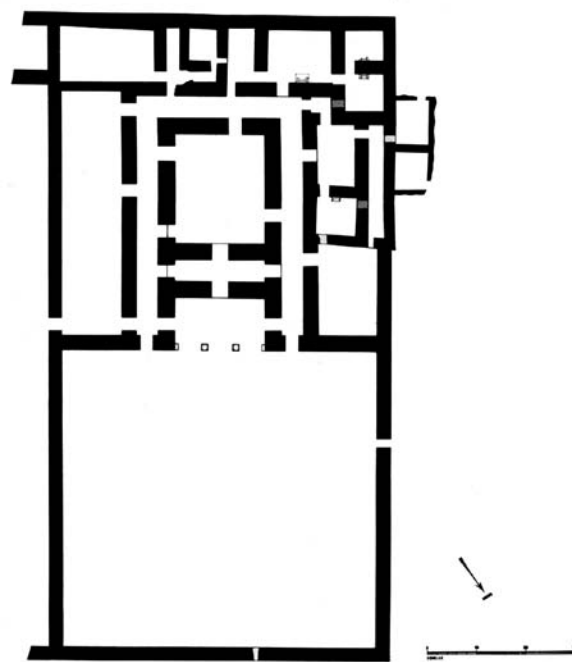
Plan of private house in residential area of Ai Khanum near Kokcha River
